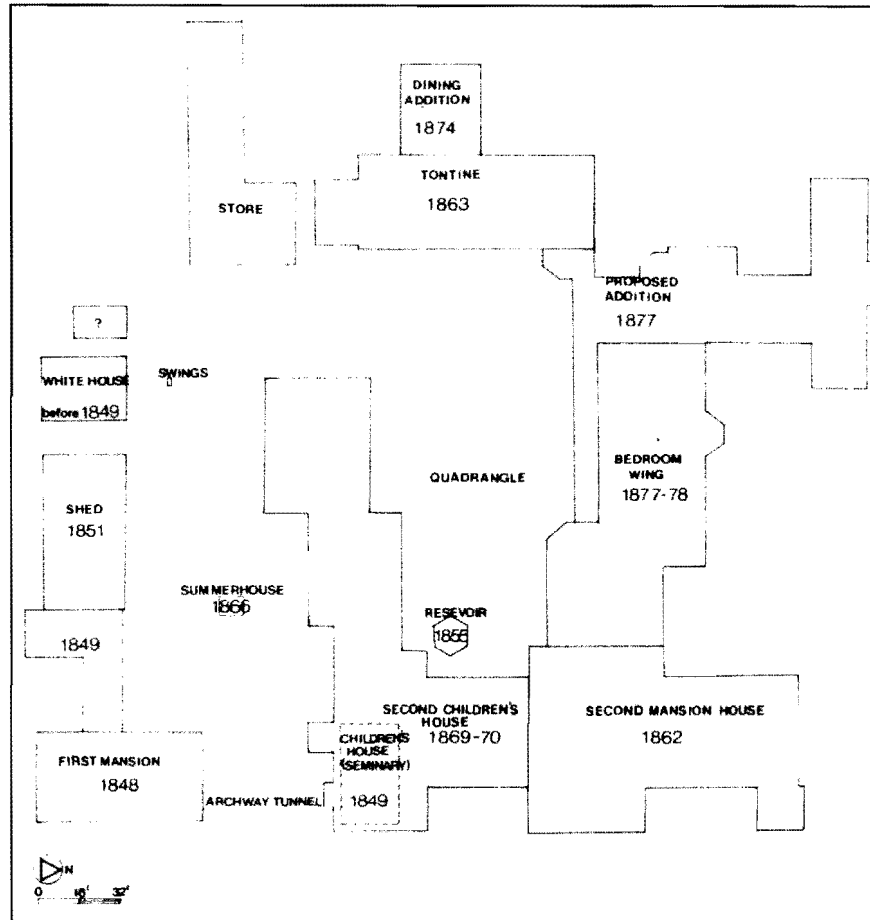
The floor plan for the second mansion house. This plan shows the U shape of the main building and the many wings of the house.
